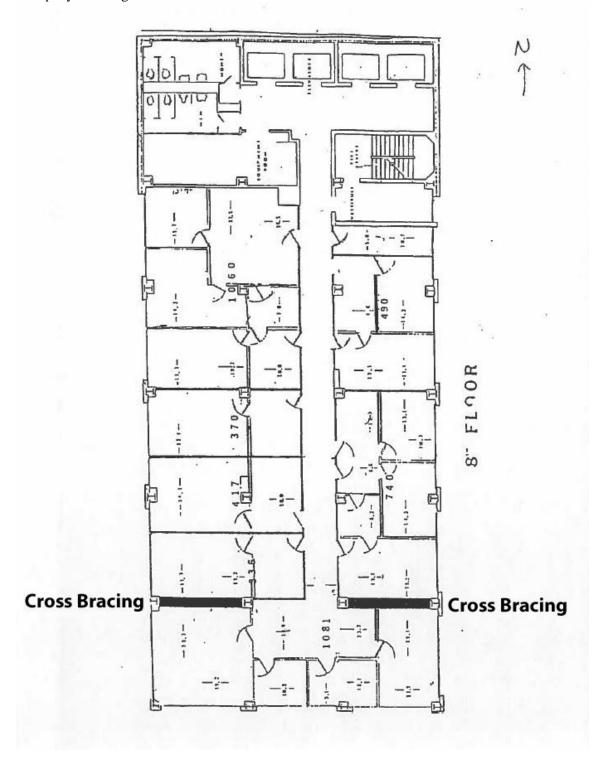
Typical Floor framing plan. Source: David S. Castle, architectural plans for the Great Plains Life Insurance Company Building, Sheet S-5.
